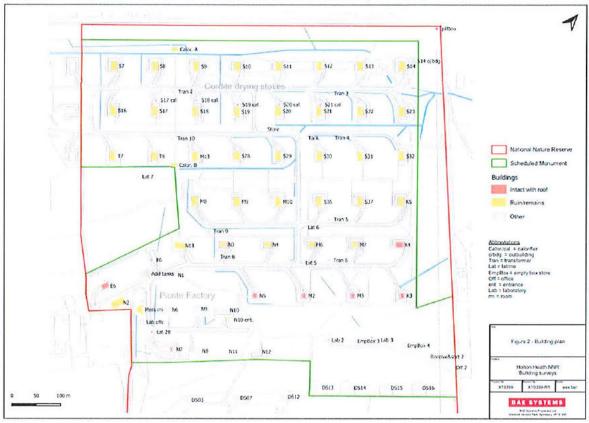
RNCF Holton Heath Building Plan (©BAE Systems).
